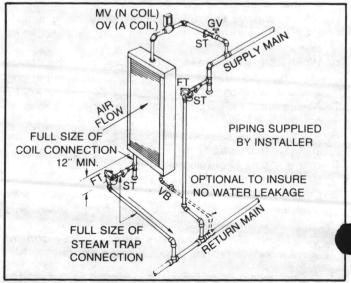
Typical Piping for Type A or N Steam Coils, Vertical Tubes for Horizontal Airflow
